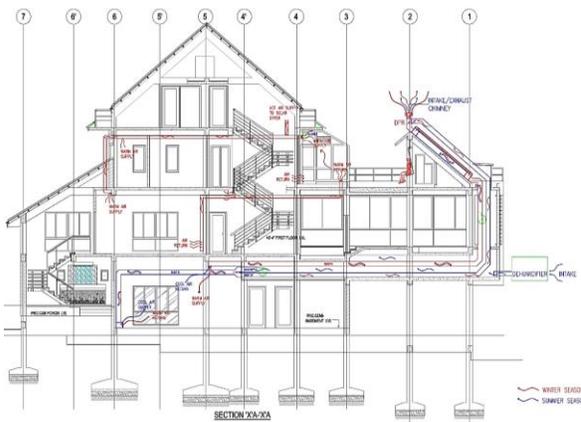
Building section showing air supply using ducts, dehumidifier and intake/exhaust chimney
